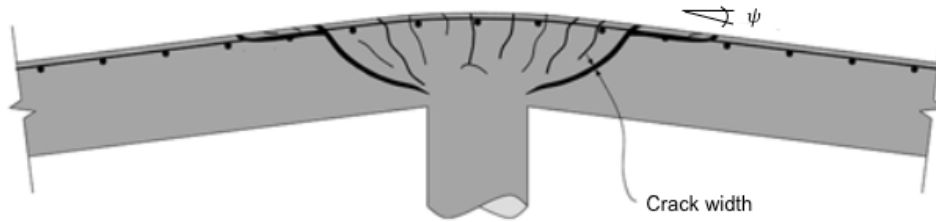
Critical Shear Crack (Adapted from Muttoni, 2008)
